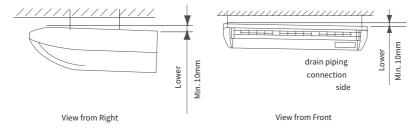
Inclination of Unit for Drain for ceiling installation
